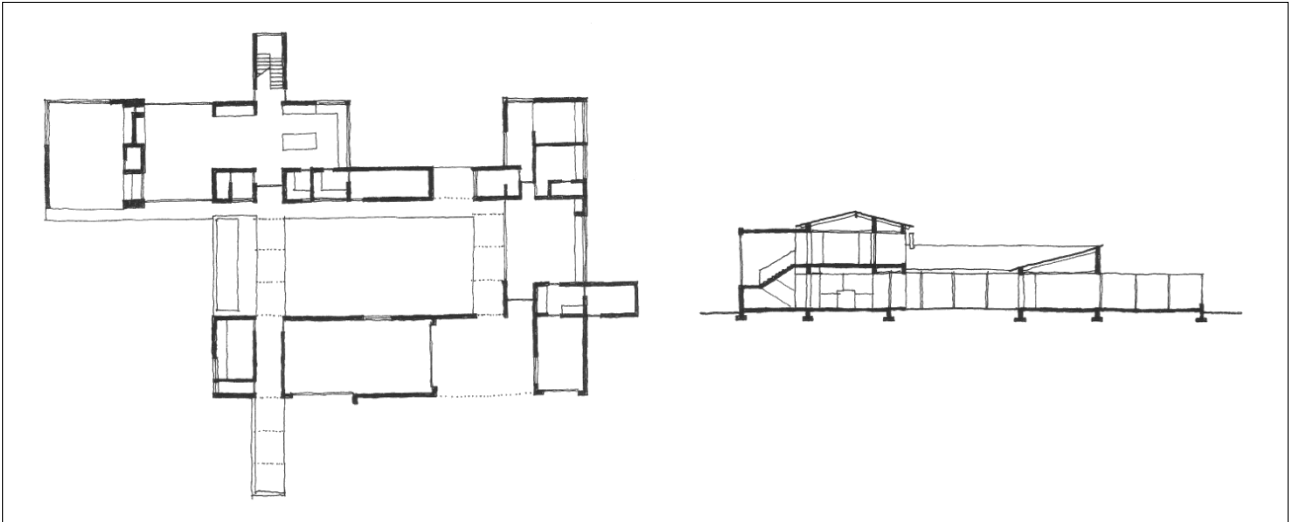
Layout plan of Falcon Street House (left) with garages below, main dwelling top left and second dwelling right; and section along entrance route (right).
